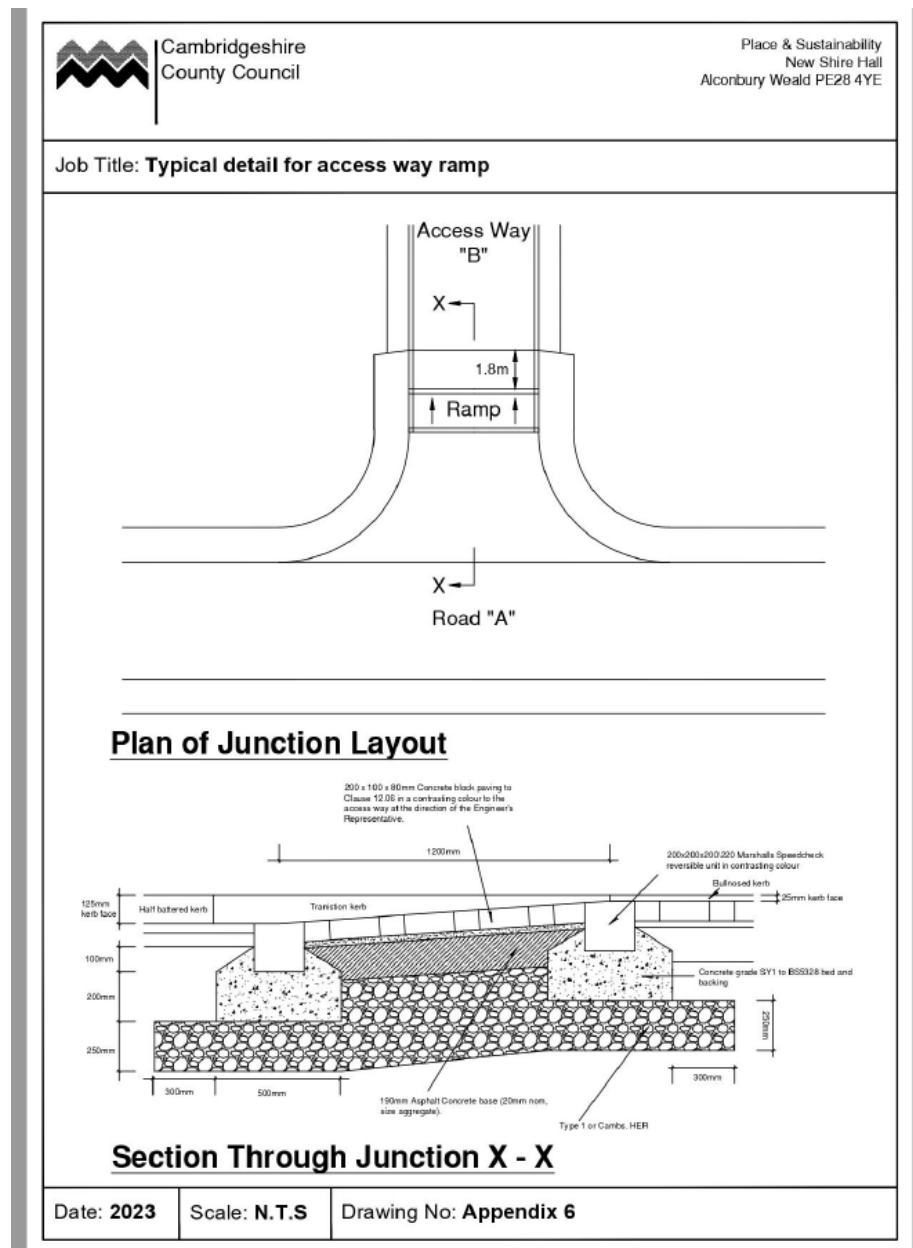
Extract from Cambridge Housing Estate Road Construction Specification
